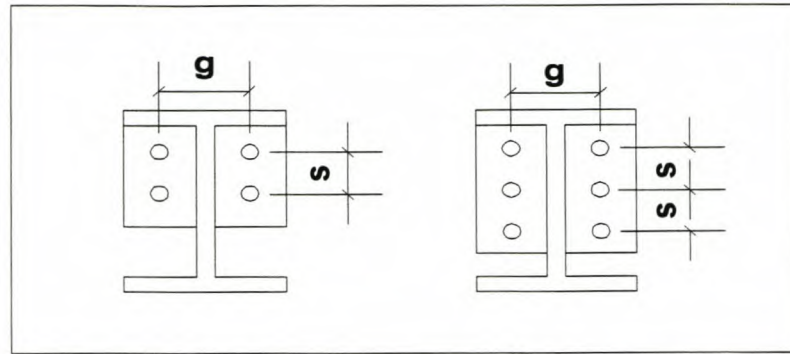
Gauge and pitch distances for welded end plate connections
